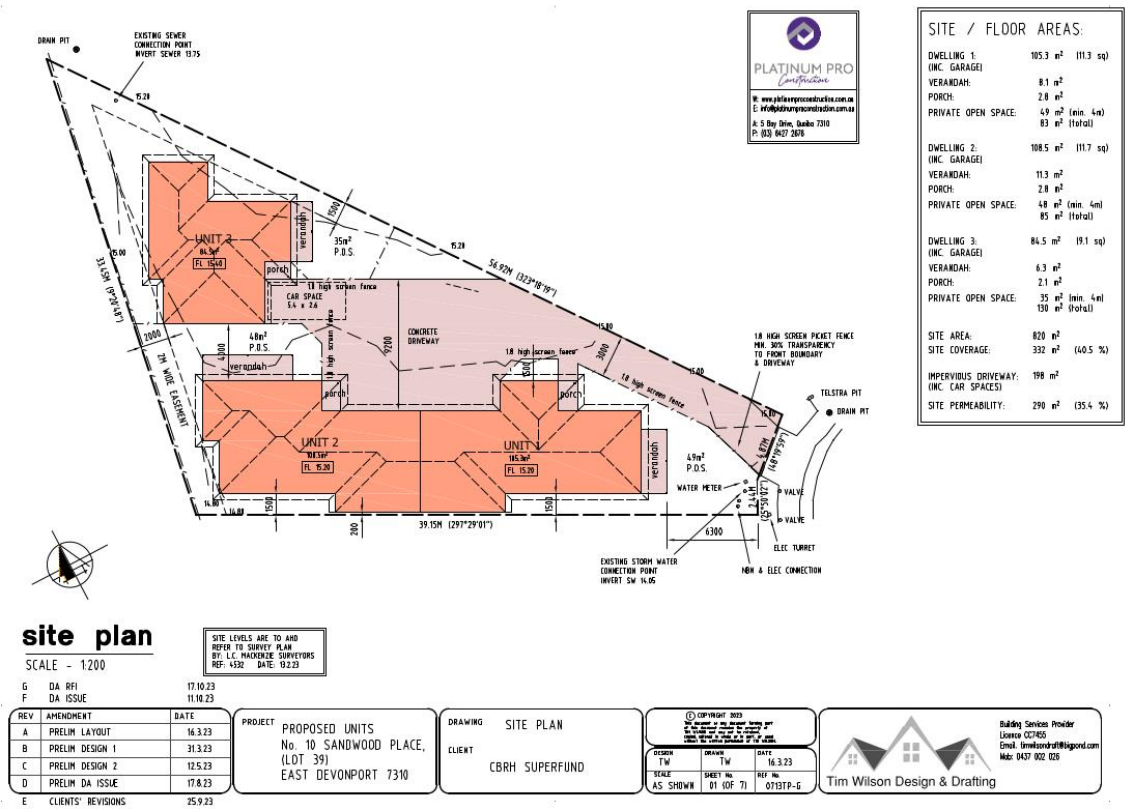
Site Plan (Tim Wilson Design & Drafting)
